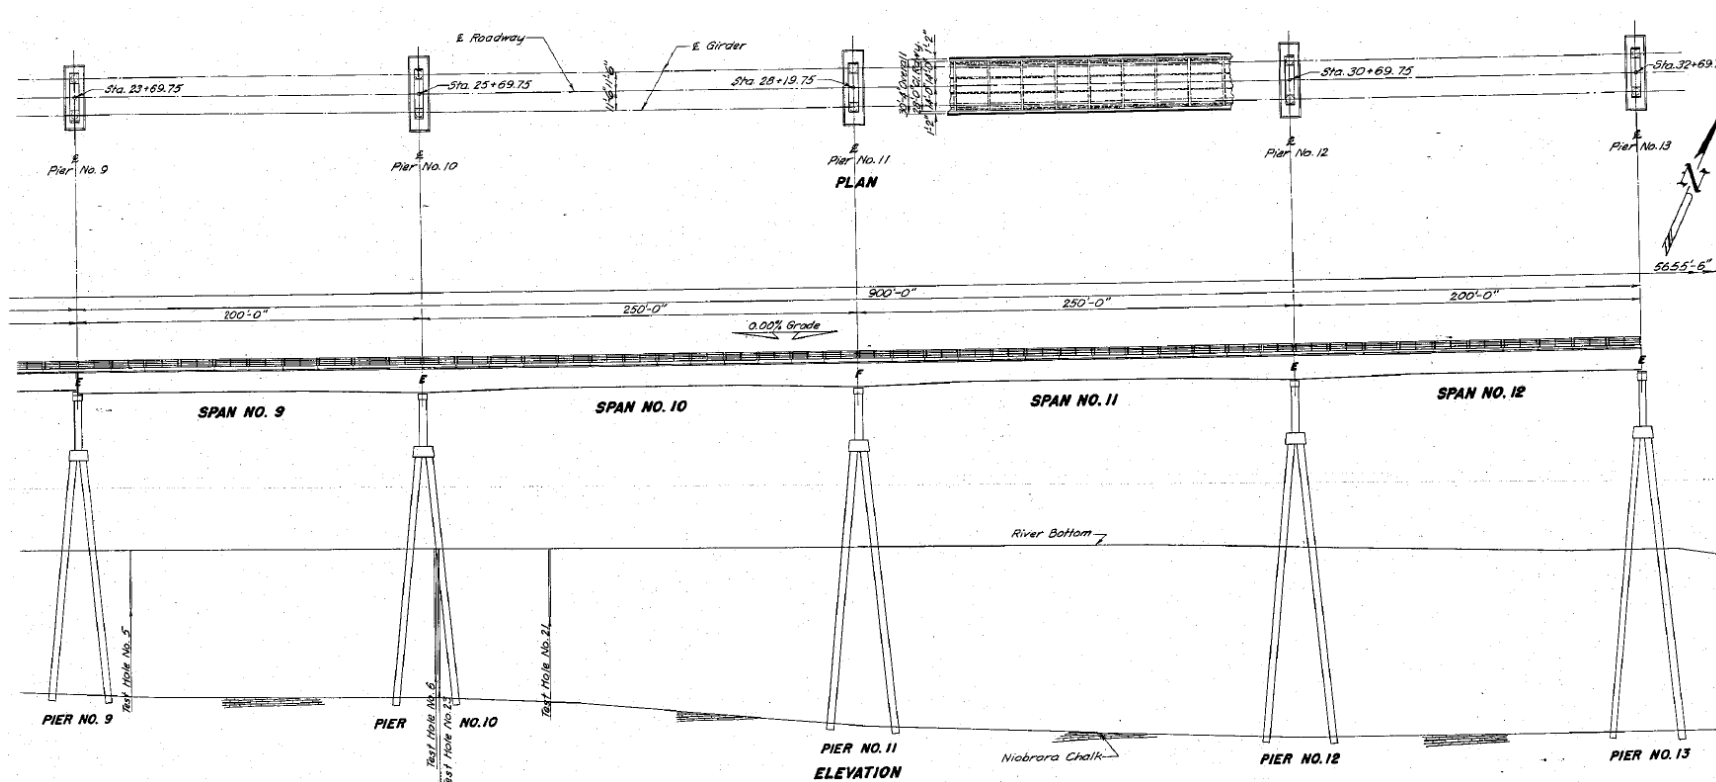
An example of the 900-foot four-span girder unit, shown in plan and elevation.<sup>6</sup>
